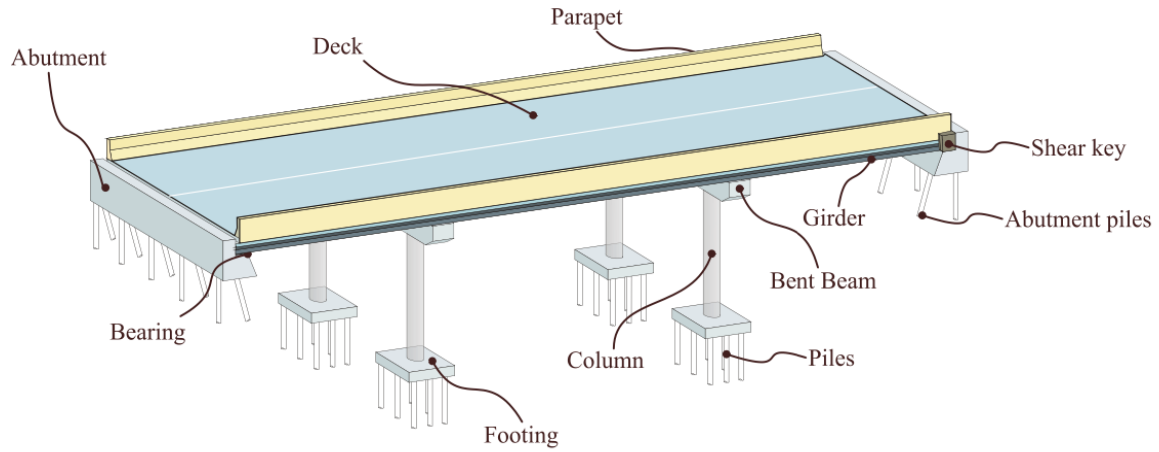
Typical highway concrete bridge components (Mangalathu 2017)
